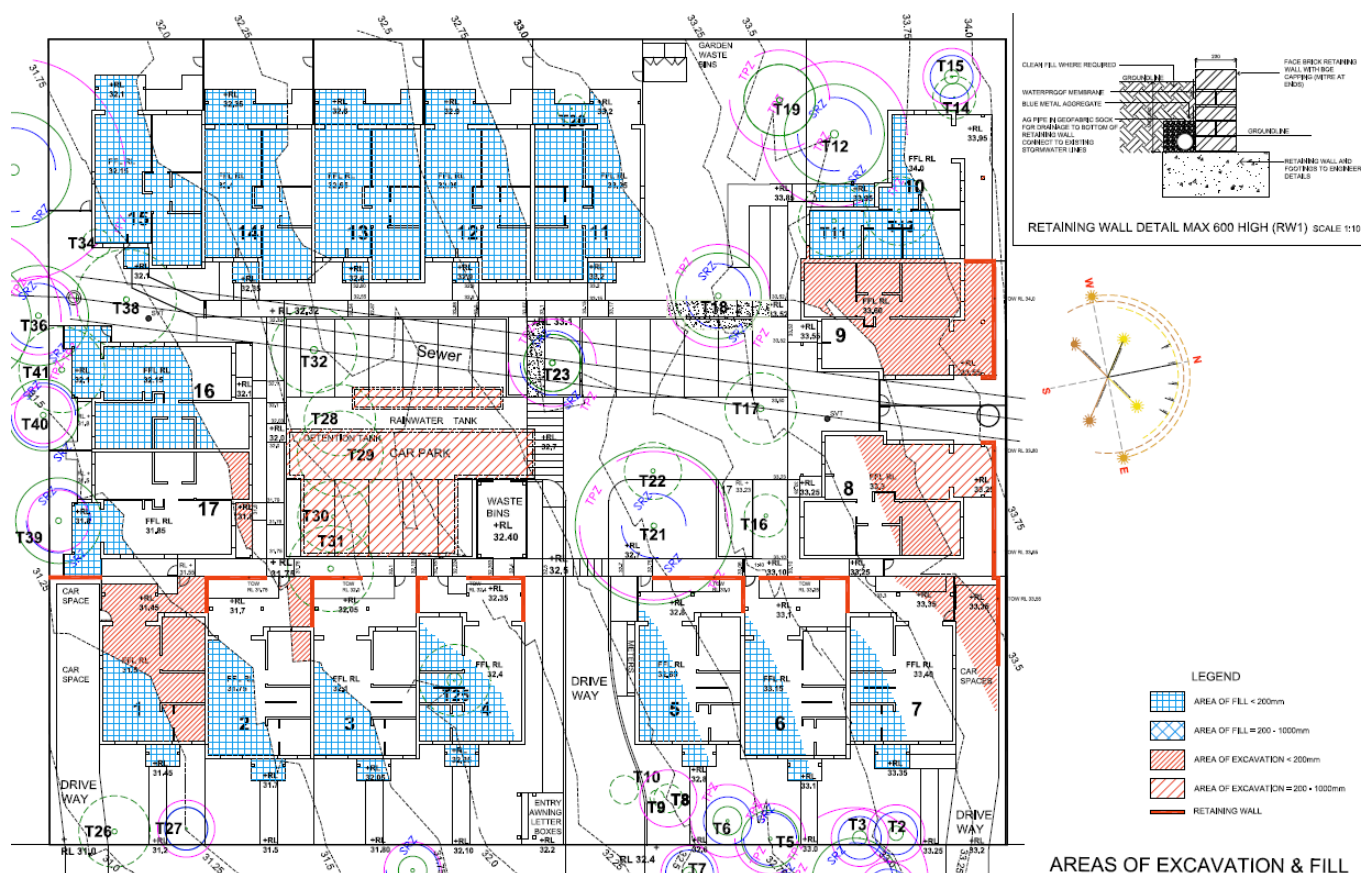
'Areas of Excavation and Fill' Plan A17 Barry Rush and Associates dated 27/04/2023
